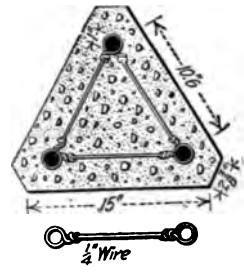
Pile for Court House Foundation at Berlin, Germany.
